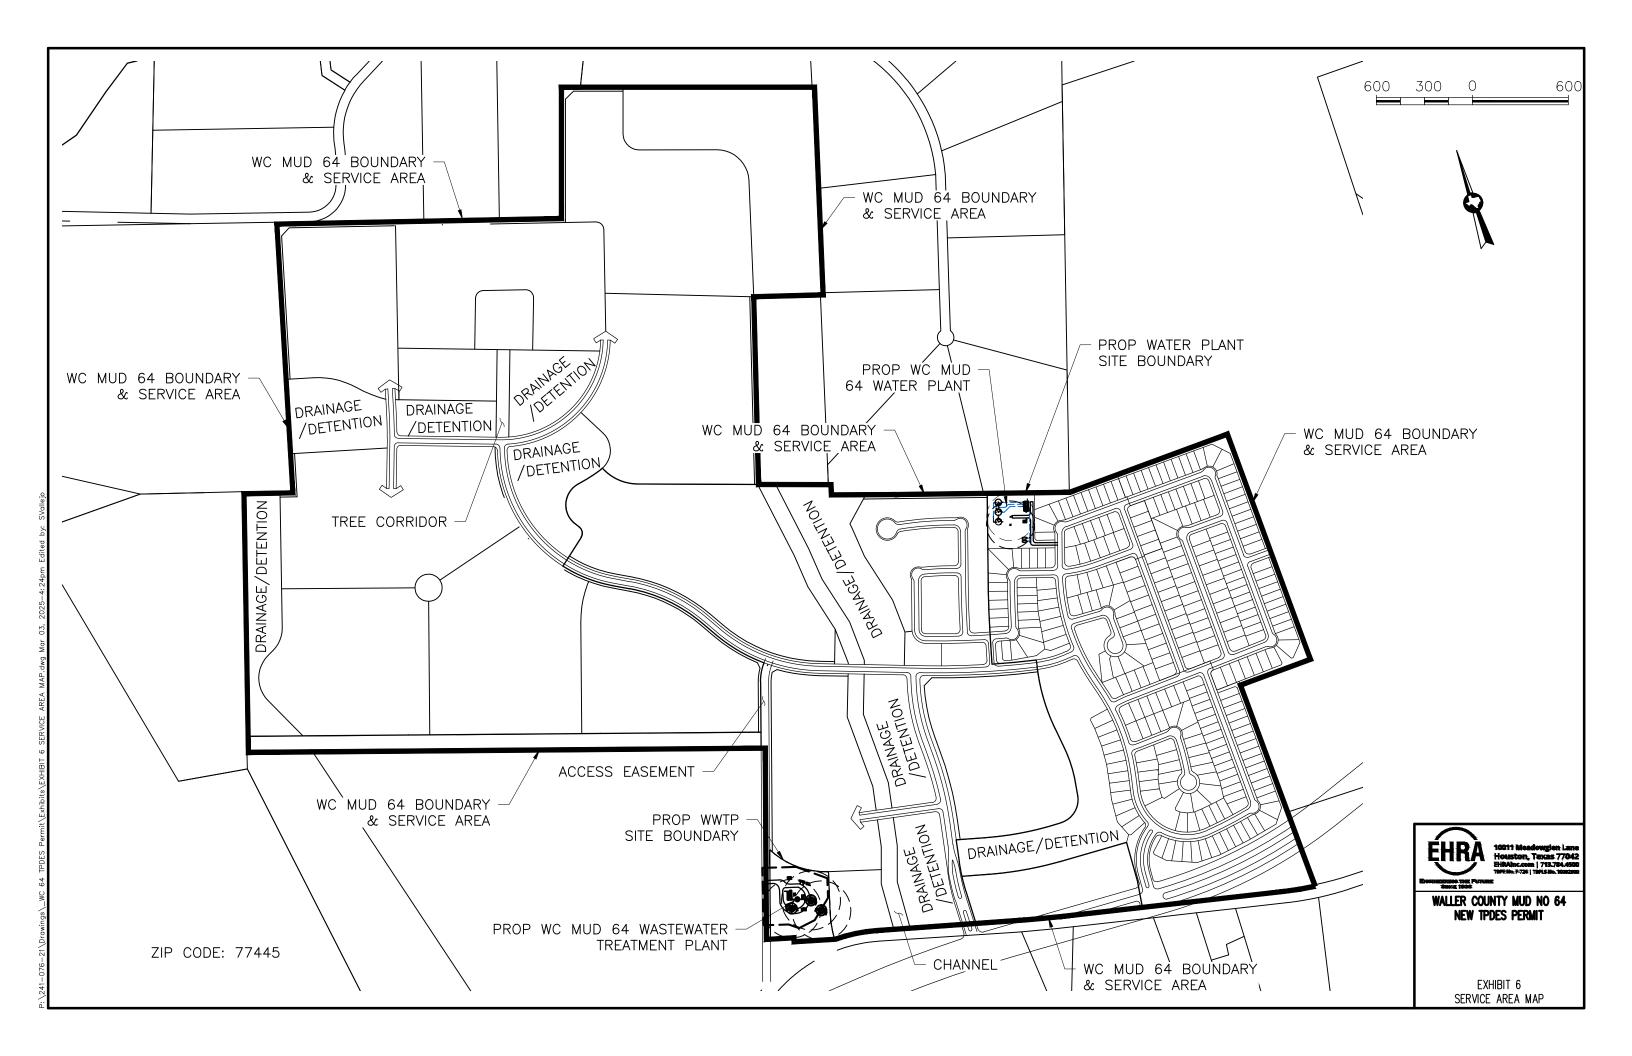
A – Site Layout (Corresponds to Technical Report 1.0, Section 3, Page 3 of 66)
